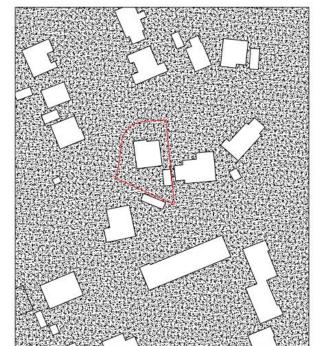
Extensions to similar property in Langside Drve, Corner site.
